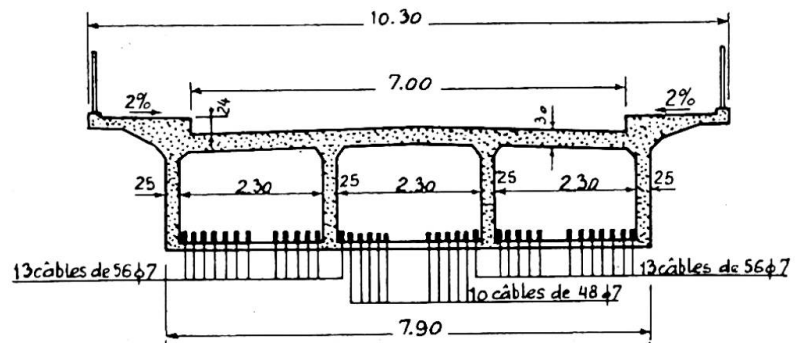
Bridge over the Meuse at Sclayn in prestressed concrete—Cross-section
